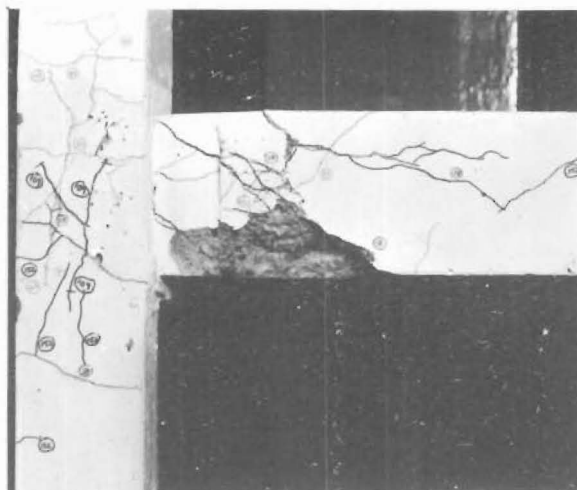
LATERAL BEAM AND COLUMN
